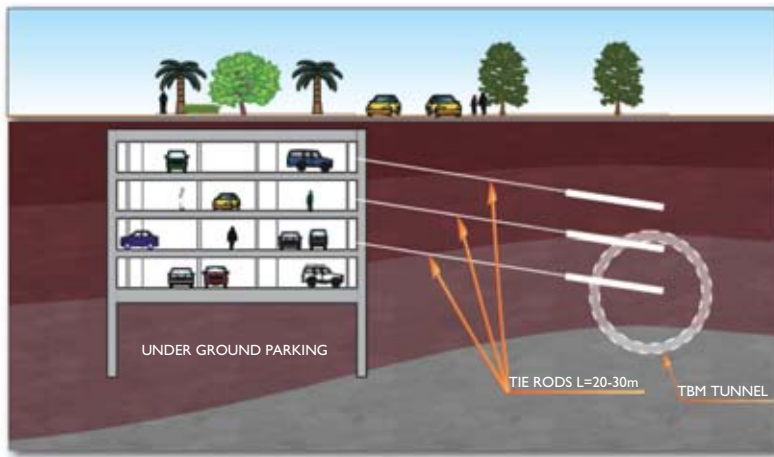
Possible interference between an underground car park and a tunnel to be constructed.
